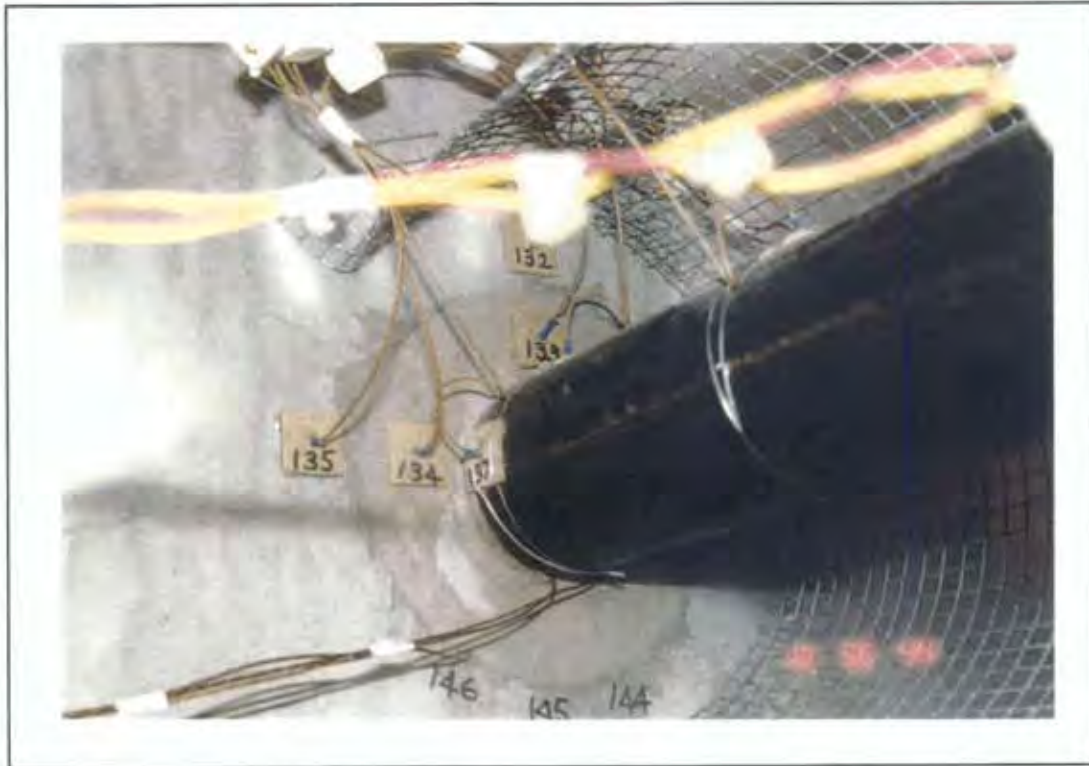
Typical Instrumentation Near Pipe Junction With Wall "Cold" Face
